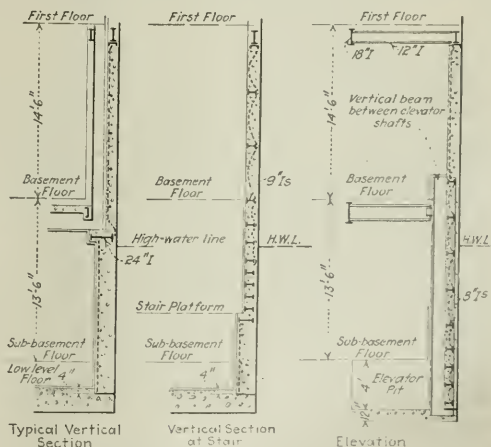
THIN RETAINING WALL AT REAR OF BANK
